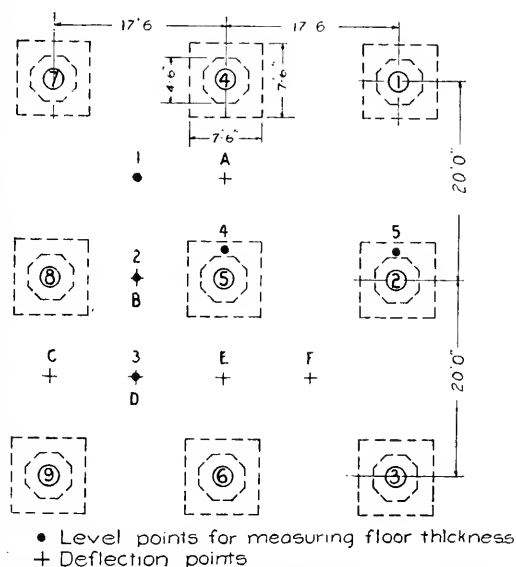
LOCATION OF POINTS FOR MEASUREMENT OF THICKNESS AND OF DEFLECTION OF TEST FLOOR IN SCHULZE BAKING COMPANY BUILDING.
